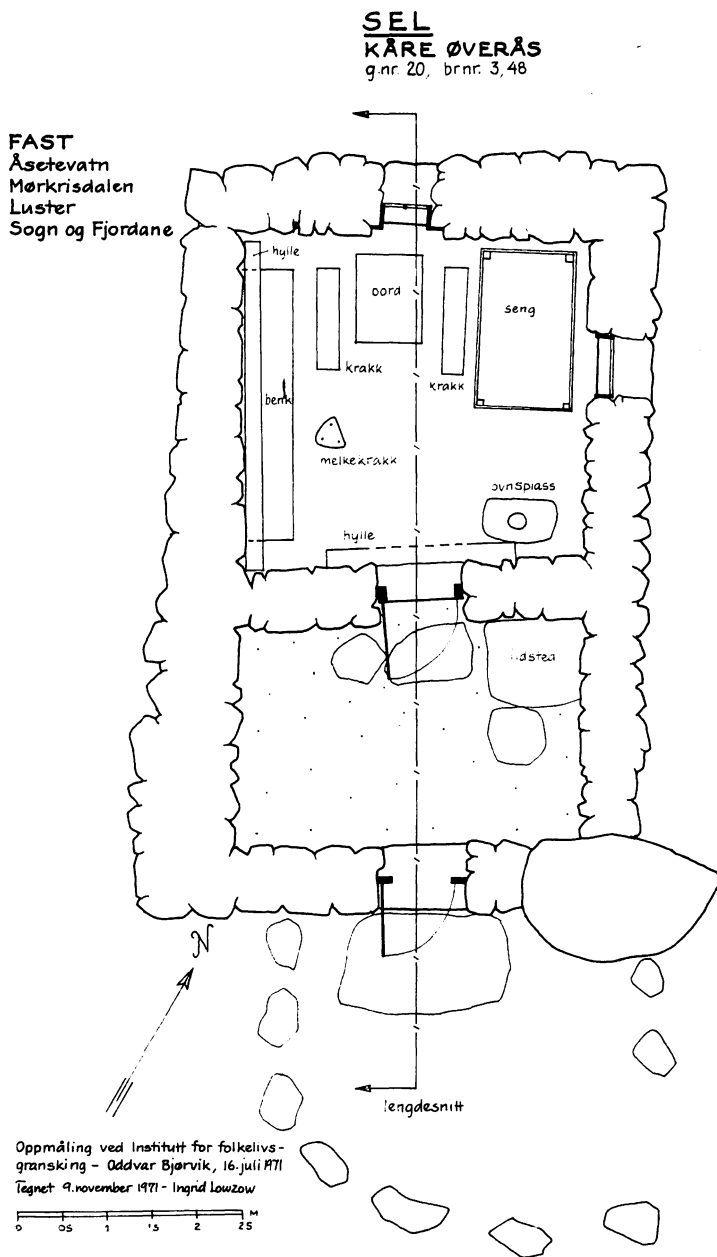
Plan, seter house, drystone construction. Fast, Mørkrisdalen, Sogn & Fjordane.
